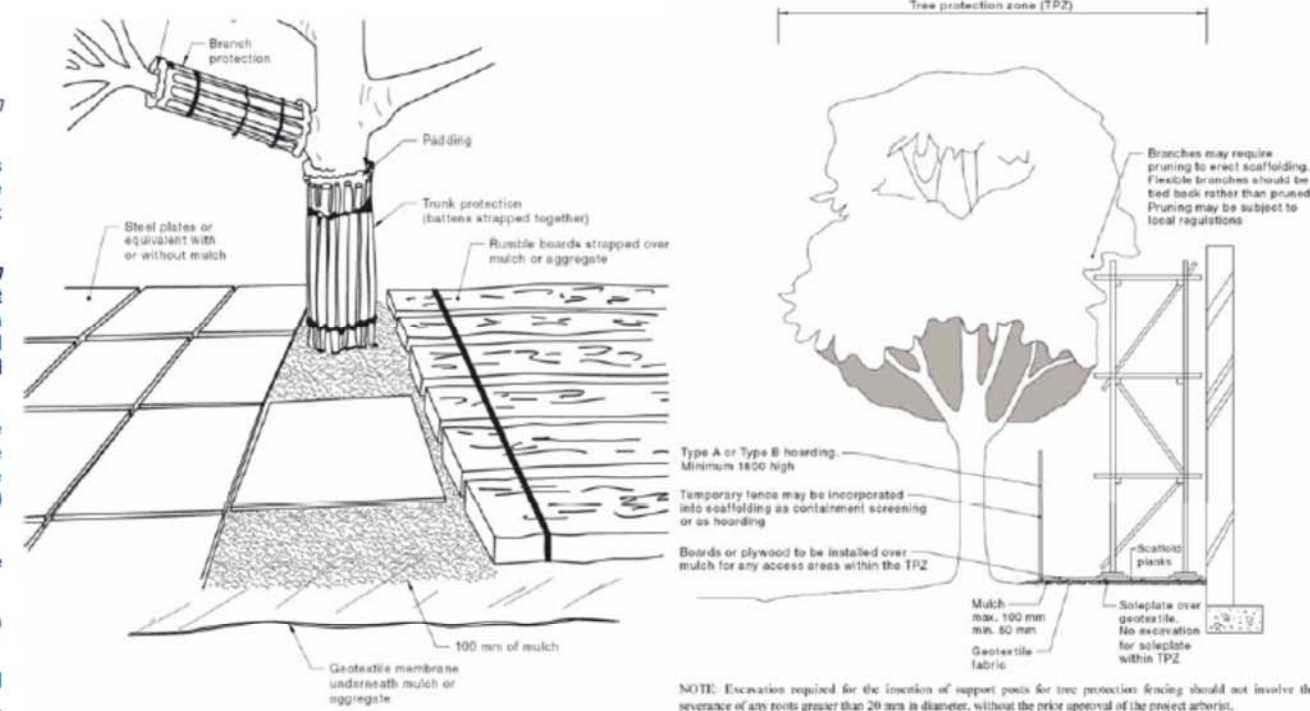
EXAMPLES OF TRUNK, BRANCH AND GROUND PROTECTION
